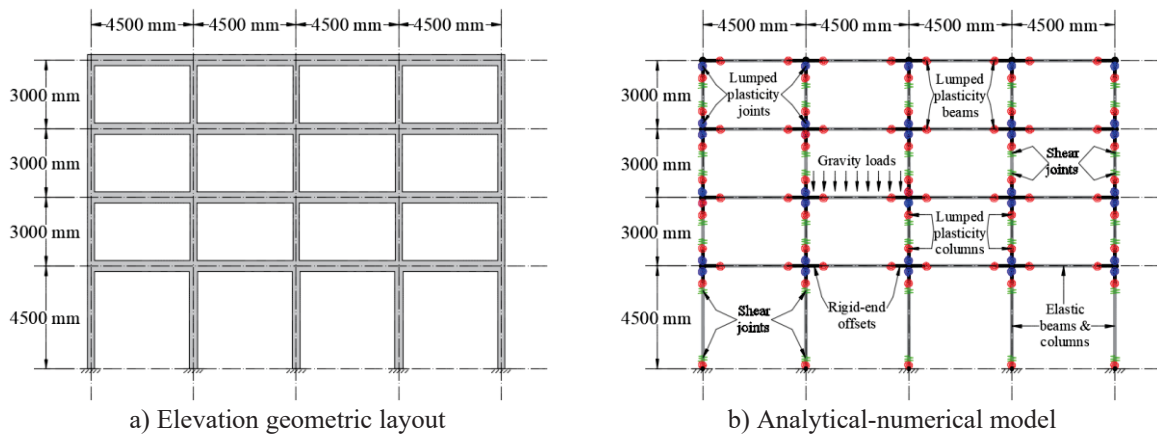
Geometric elevation definition and modelling strategy of the buildings.
